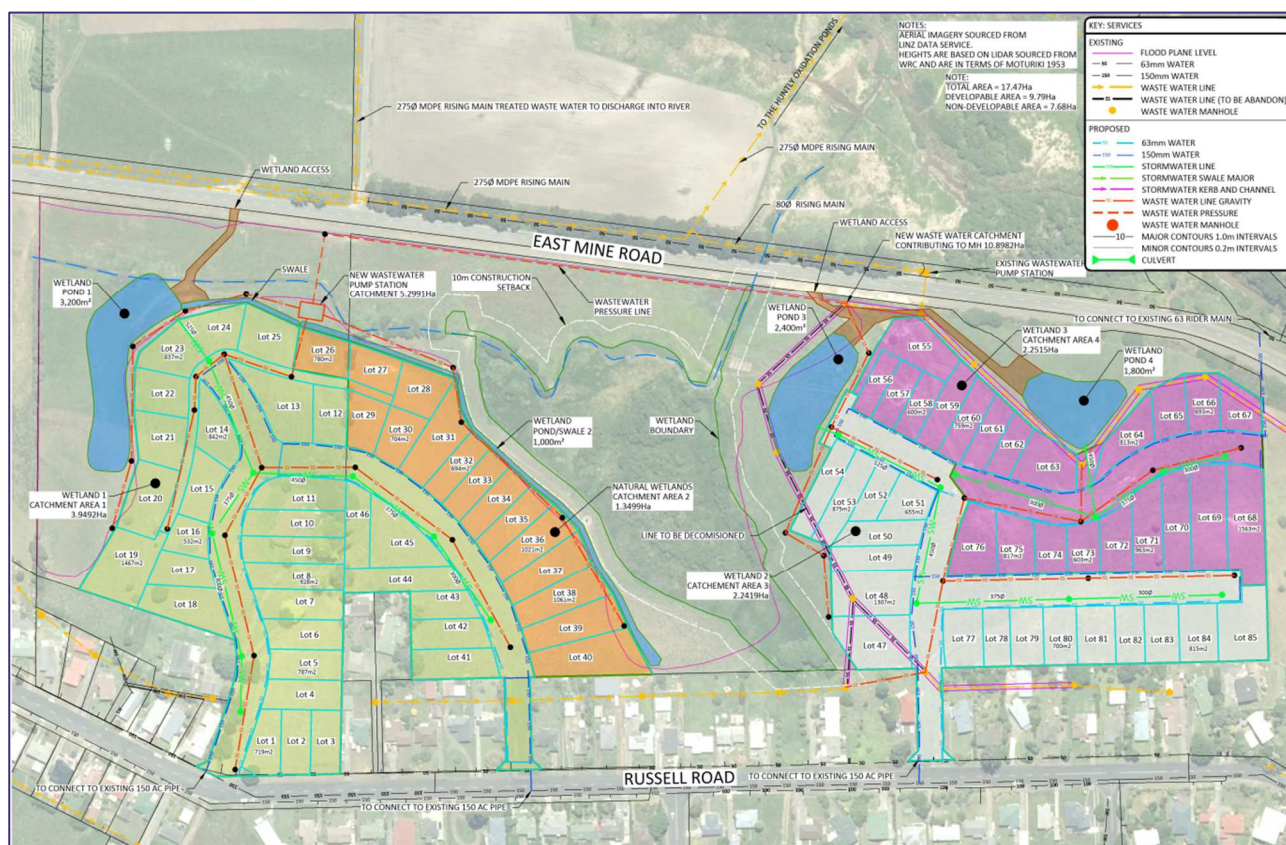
Proposed Residential Zone layout. Abstract from drawing 144370-02-0702.
